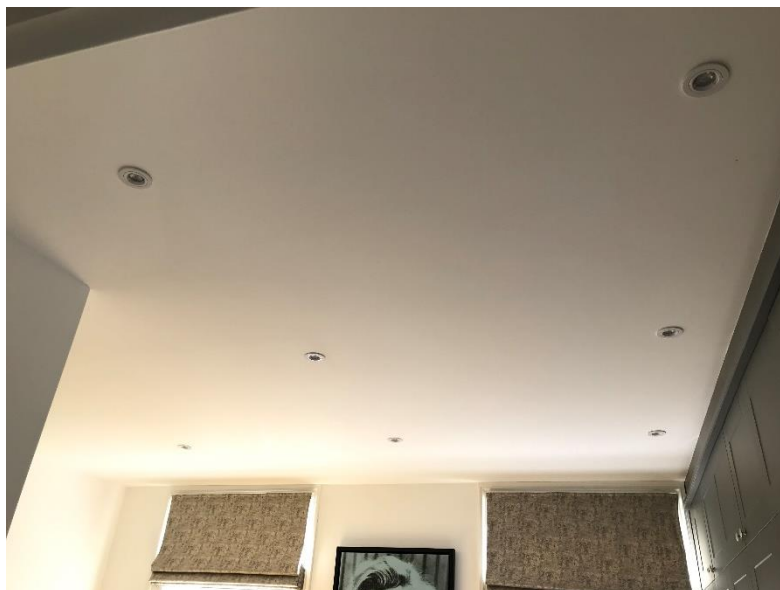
Typical arrangement of spot lighting to front bedrooms
